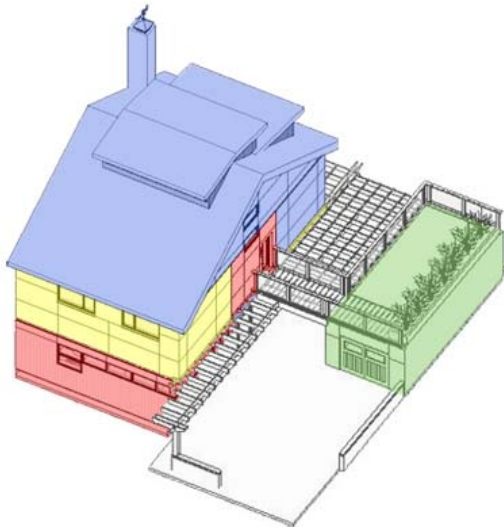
Building Blocks design, winner of the Archetype Sustainable House competition
